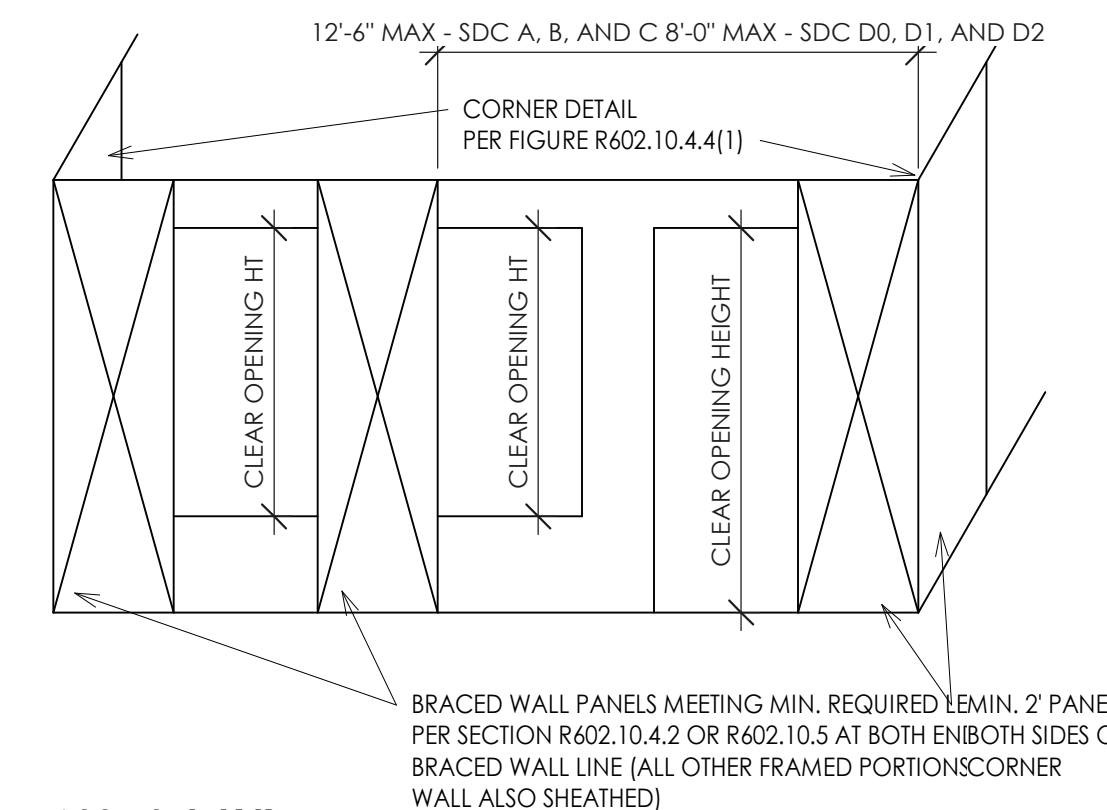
(4) BRACED WALL LINE WITH CONTINUOUS SHEATHING FIRST BRACED WALL PANEL AWAY FROM END OF WALL LIE WITHOUT TIE DOWN
